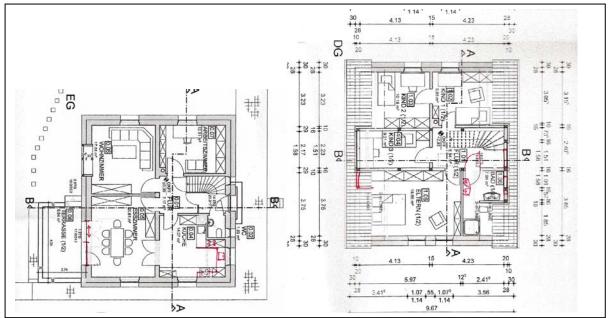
floor plans of ground floor (EG) and 1. floor (DG)
